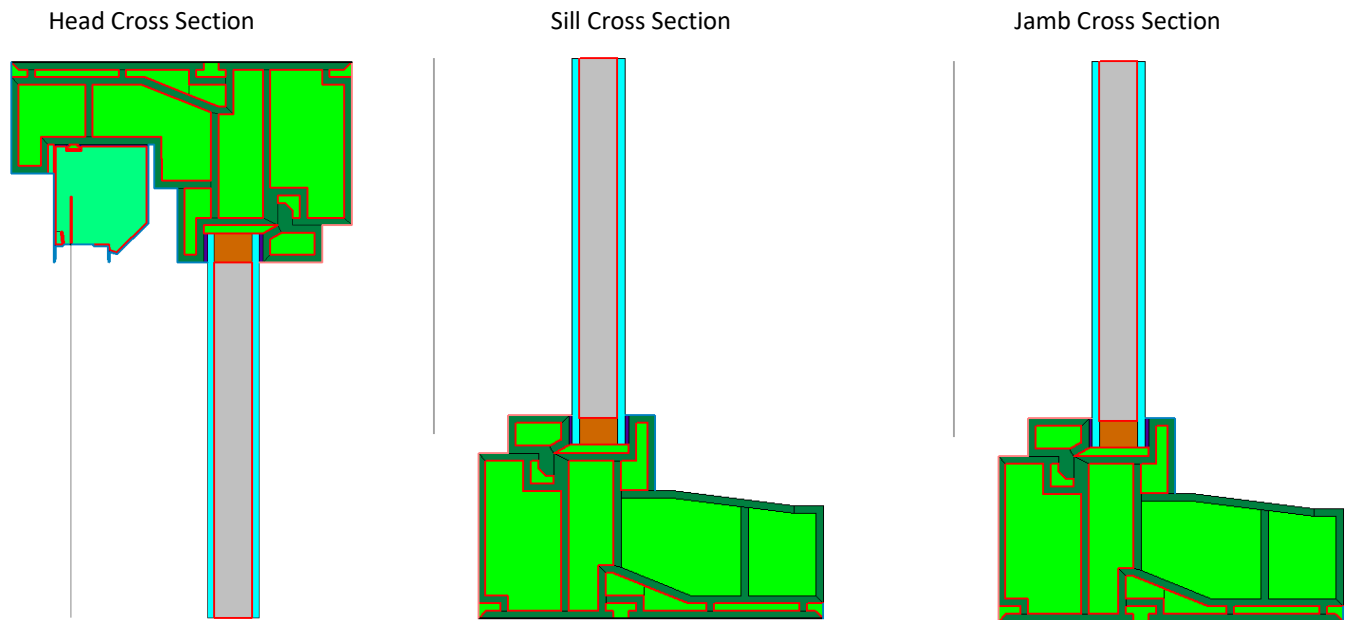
Head, Sill and Jamb cross sections for Closed Roller Shade on the exterior of a glazing system
